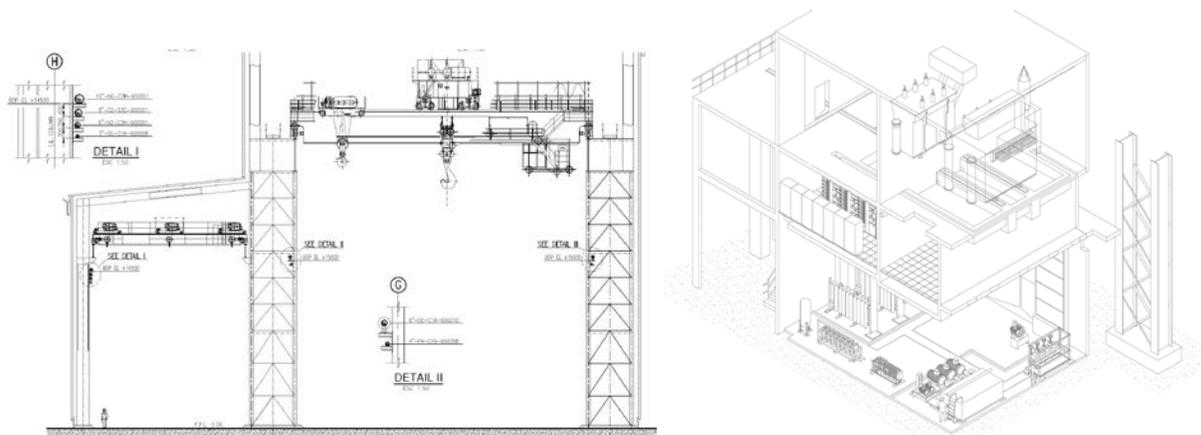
Cross section of the main building and 3D view of the EAF transformer room building
